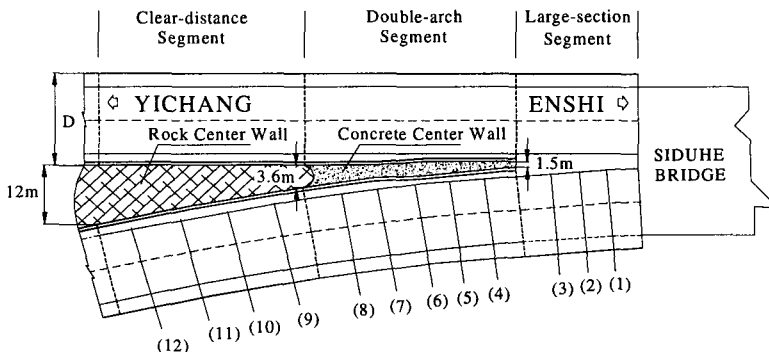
Plane layouts of the diverging tunnel and monitoring sections at Baziling.
